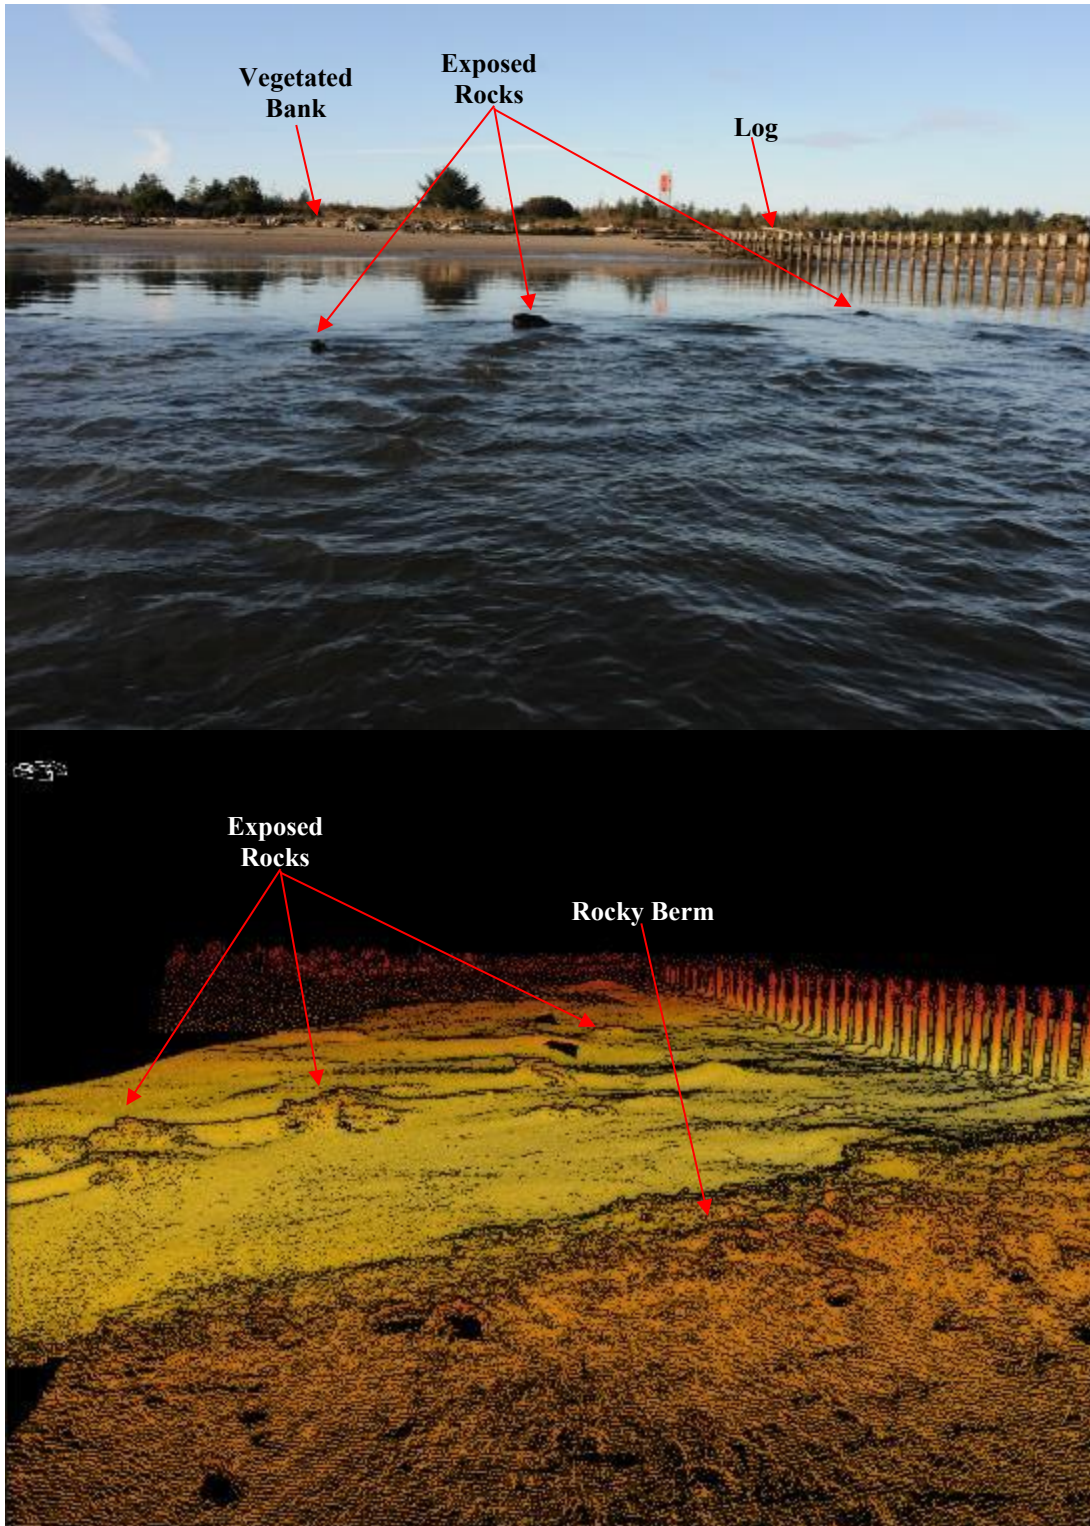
Pile Dike 7.0 photograph and point cloud viewed from downstream looking shoreward.
